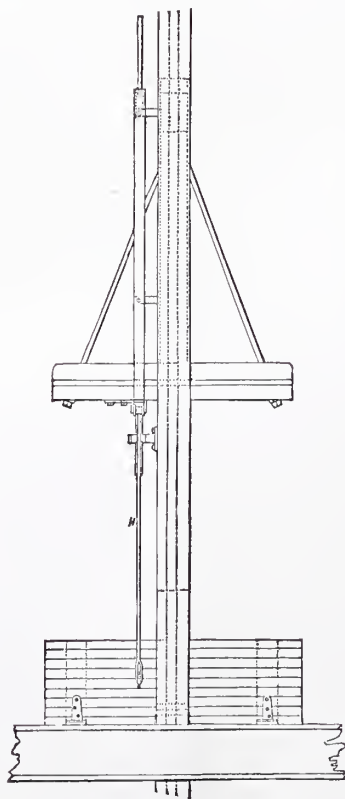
Side View of Elevator Car, Hatchway and Levers.
